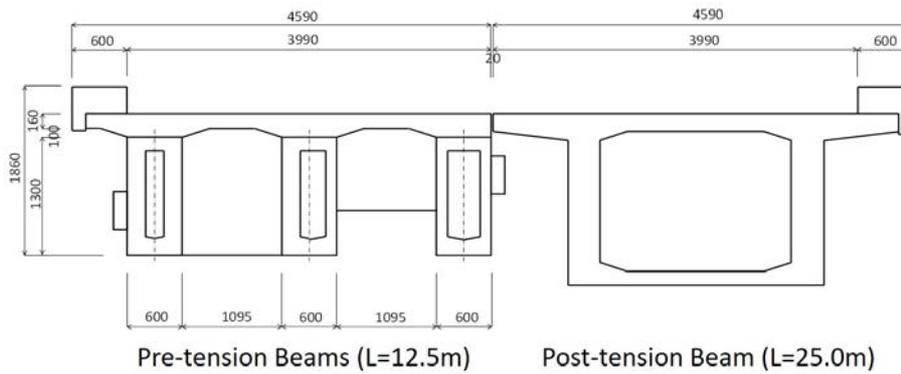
Cross-section of pretensioned and post-tensioned beams
